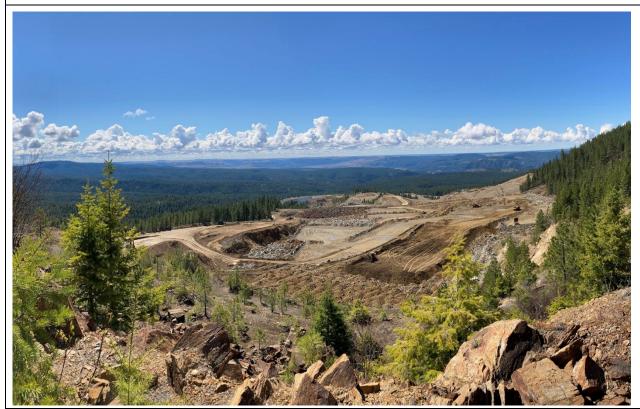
View of Pit 4 from the Pit 4 Overlook (taken on April 26, 2021).
